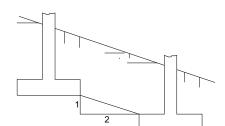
DETAIL OF LIMITING SLOPE OF ADJACENT FOOTINGS
